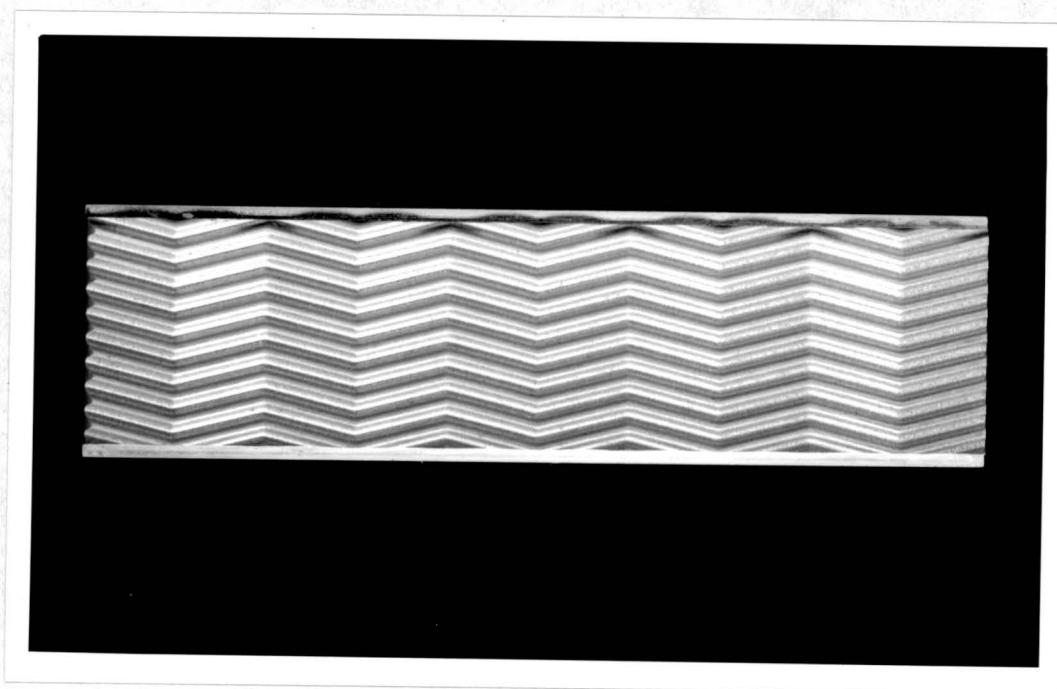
Plan view photo of a typical surface (surface 3A of Type 1 in this case).
